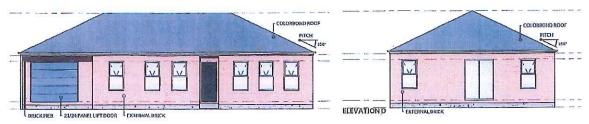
Proposed elevations facing King Street (LHS) and Main Road (RHS), as per application.
